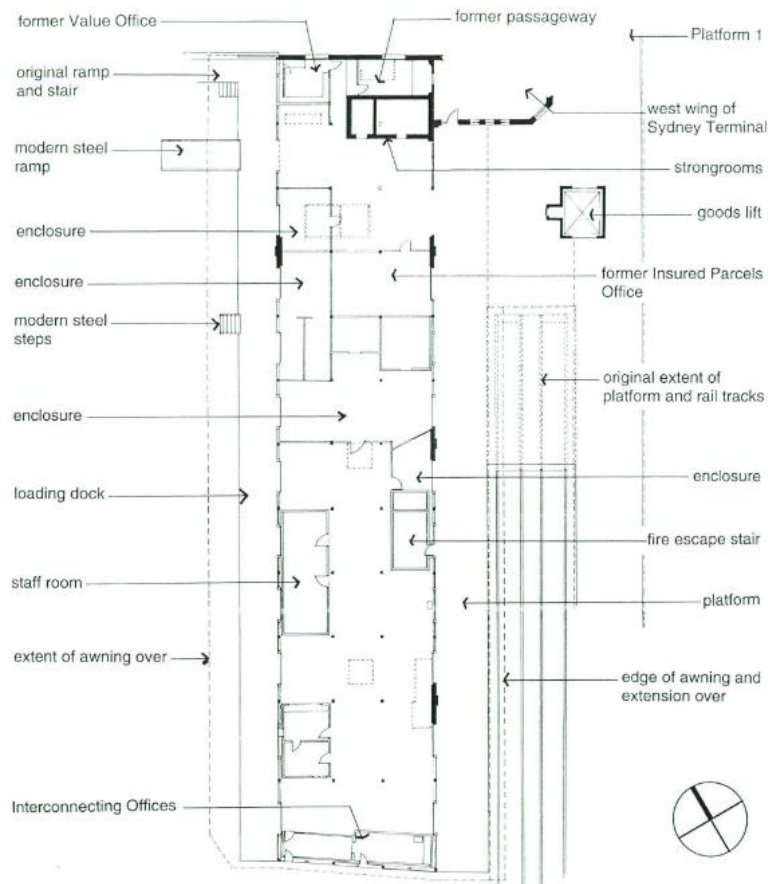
Existing Floor Plan of Inwards Parcel Shed, Sydney Terminal¹
